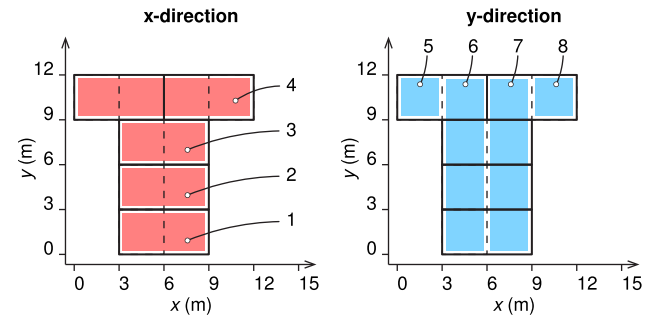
Rows of horizontal cuboids on the first floor of design 1.
